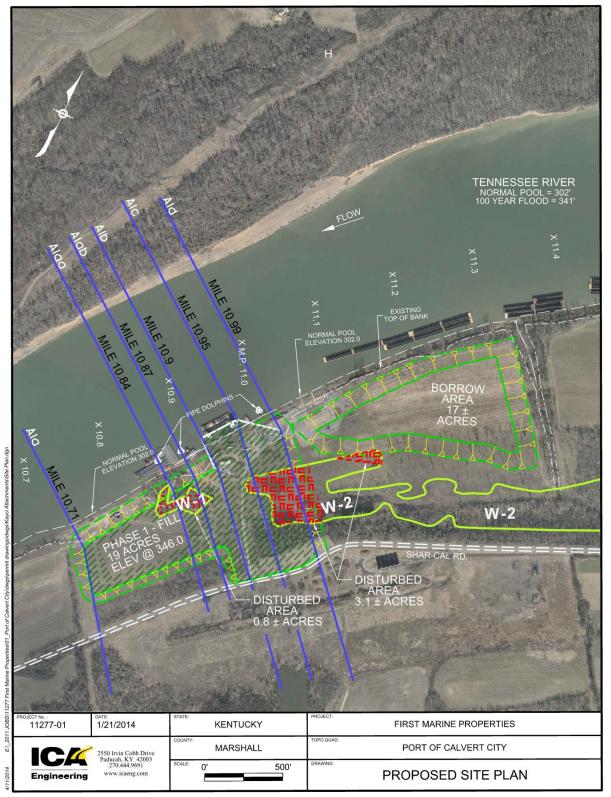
Site plan of proposed facility including wetland areas expected to be disturbed.
